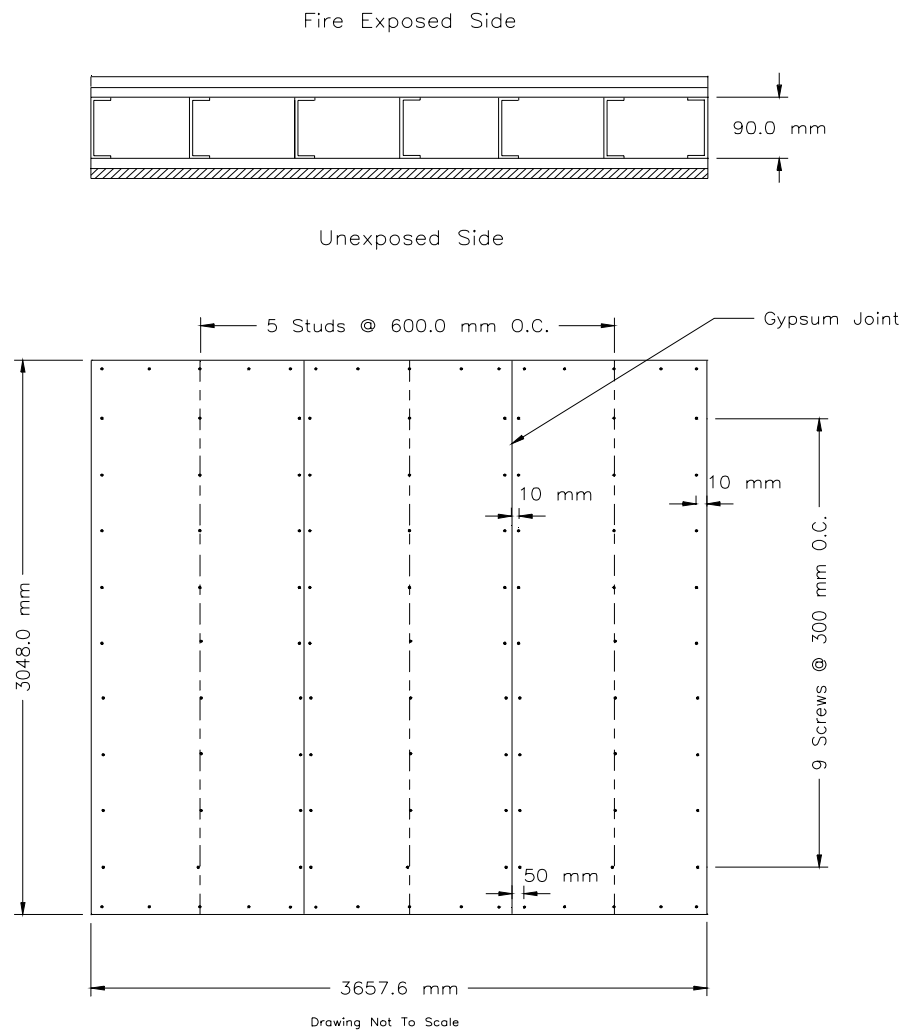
Screw Locations For Steel Stud, 2x2 Gypsum Board Layers,
